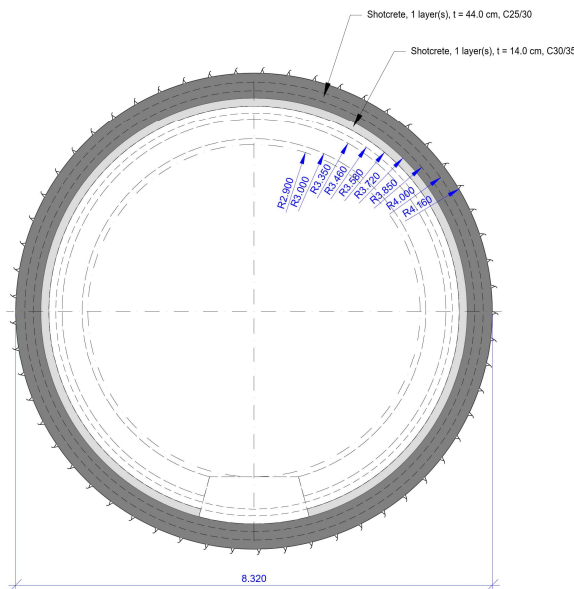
Cross section output on drawing – Shotcrete with invert tubing only in shotcrete SCT2
